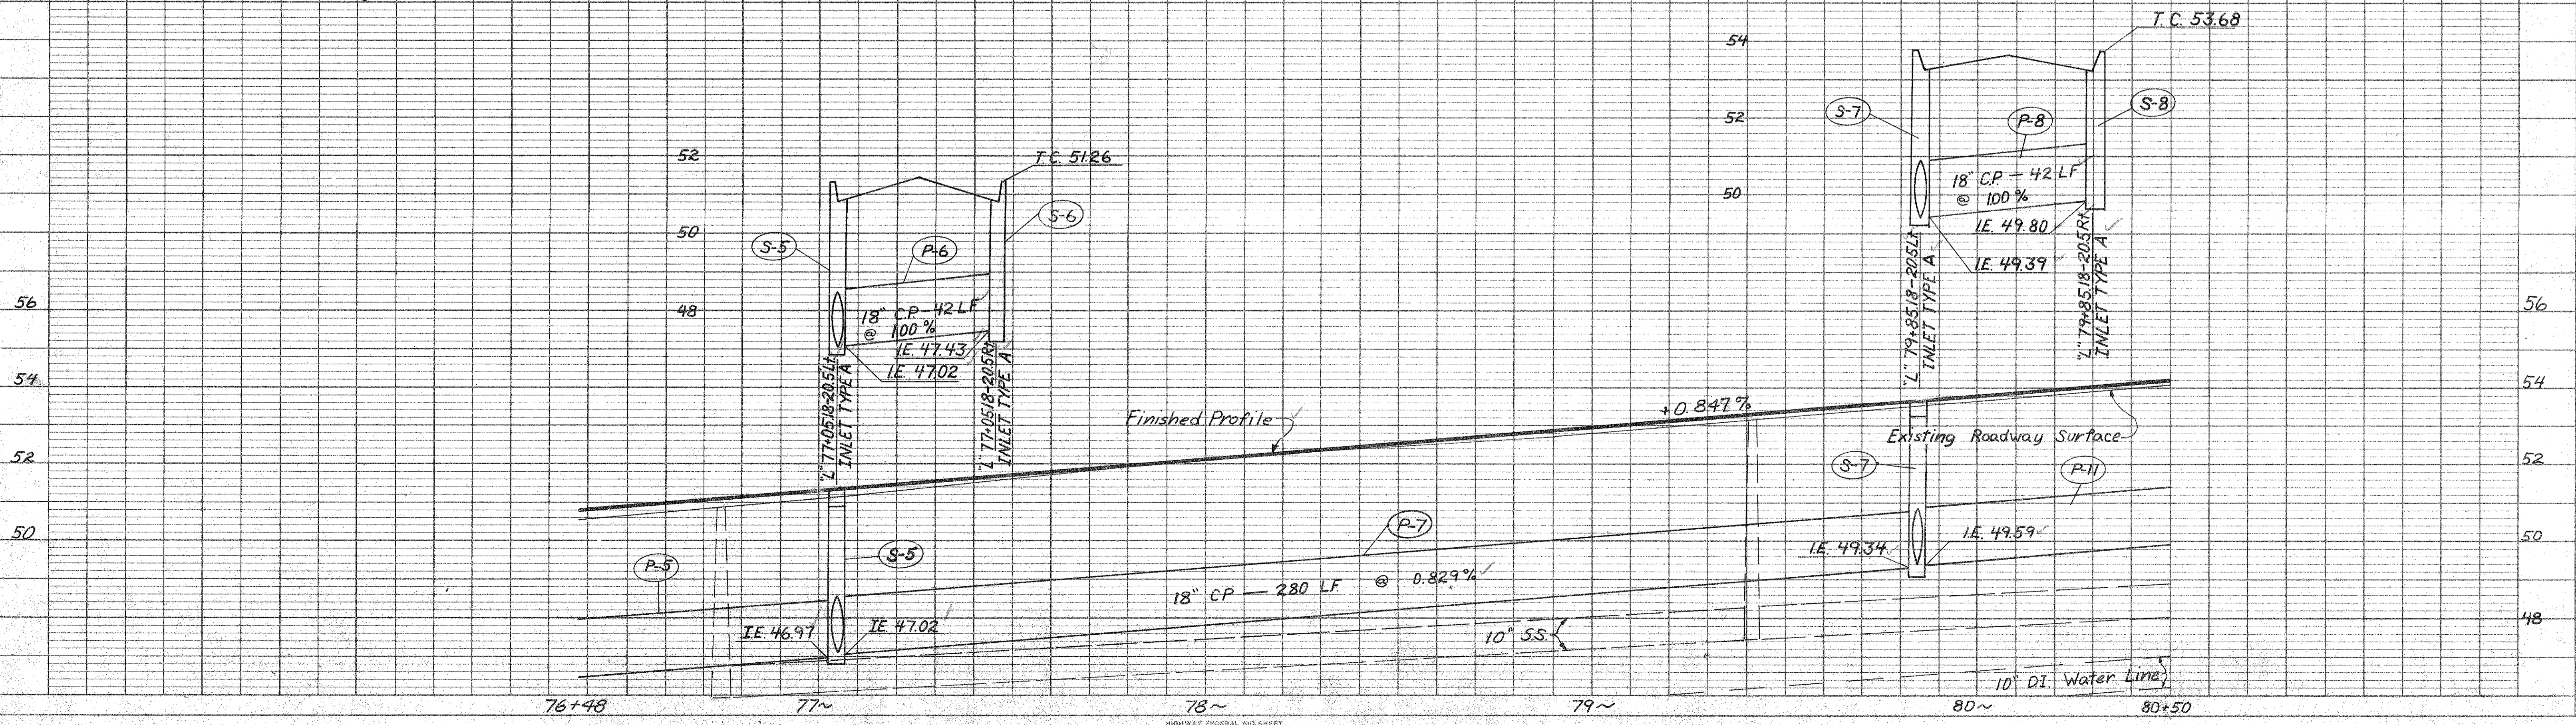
SINGLE PLAN AND PROFILE-FULL LINE
